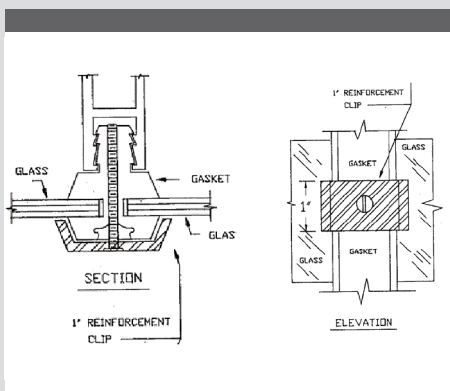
Retaining clips for lock-strip gasket. Diagram and image courtesy of Griffith Rubber Mills.
